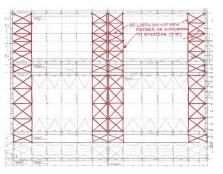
Concept sketches of the likely extent of the required retrofitting works.
